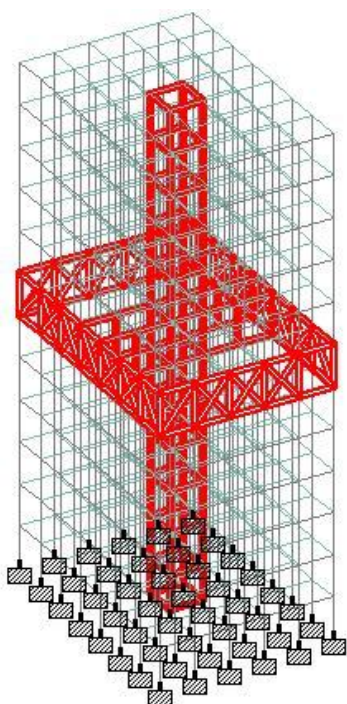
3D view of case (RA6-OTA) Residential Apartment with Shear core outrigger and optimized truss belt supported system A
